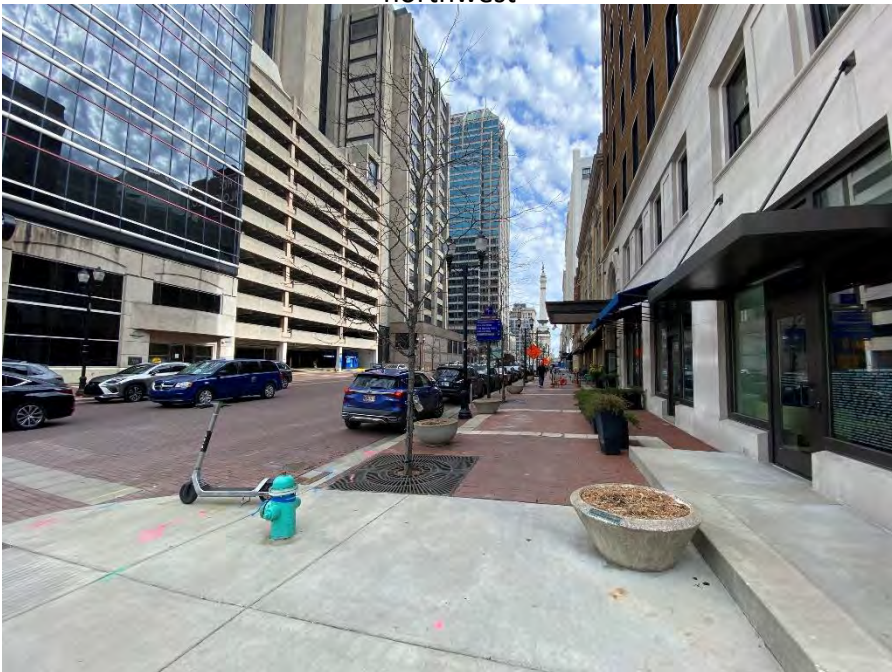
On the southeastern side of Market St and Capitol Ave, looking east
